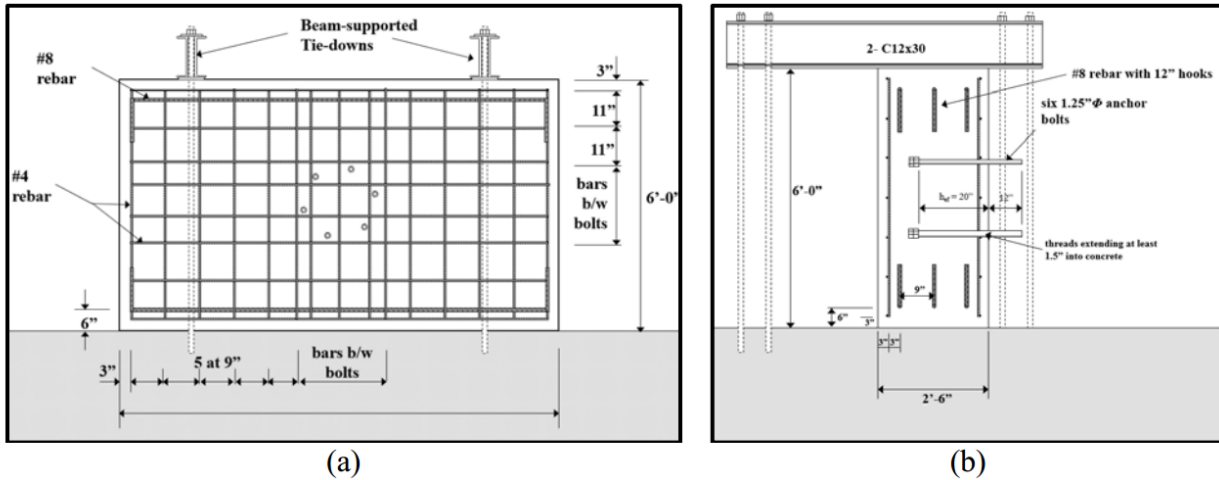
Front (a) and side (b) views of anchor placement details for test specimen blocks
